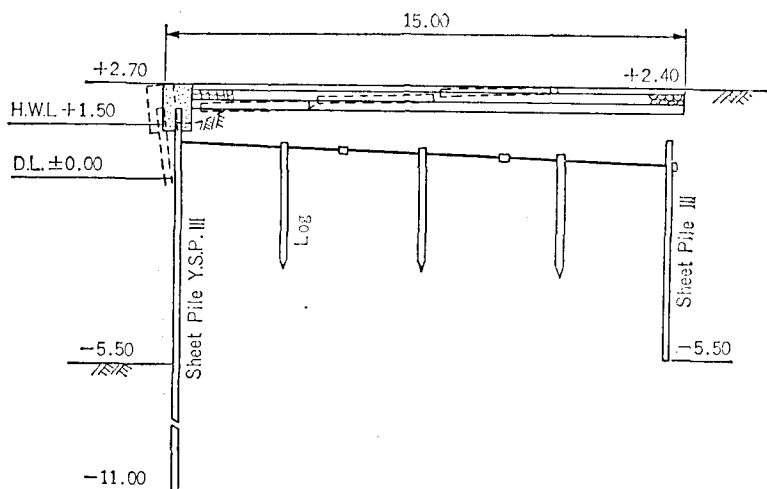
Cross Section of Sheetpile Bulkhead in Konakano No 1 Quaywall in Hachinohe Port
